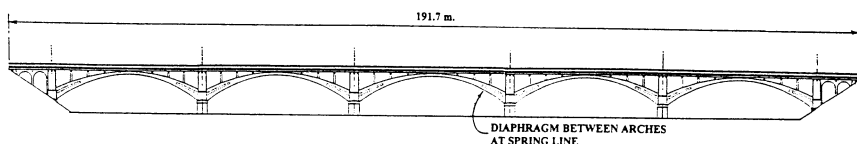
Colorado Street Bridge, Pasadena, Seismic Strengthening
